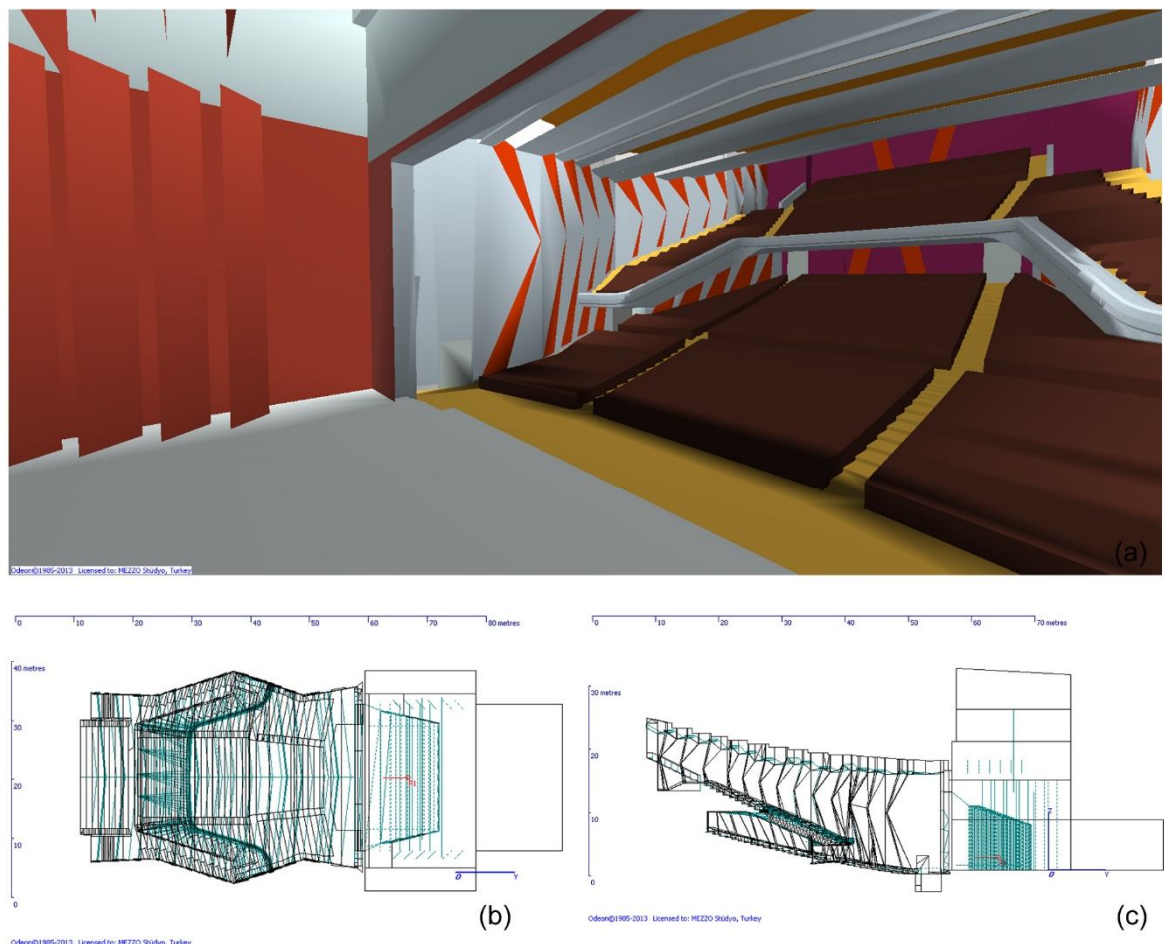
Multi-purpose auditorium acoustical model a) 3D Open-GL view, b) plan view, with source position (red), c) section view (red)
